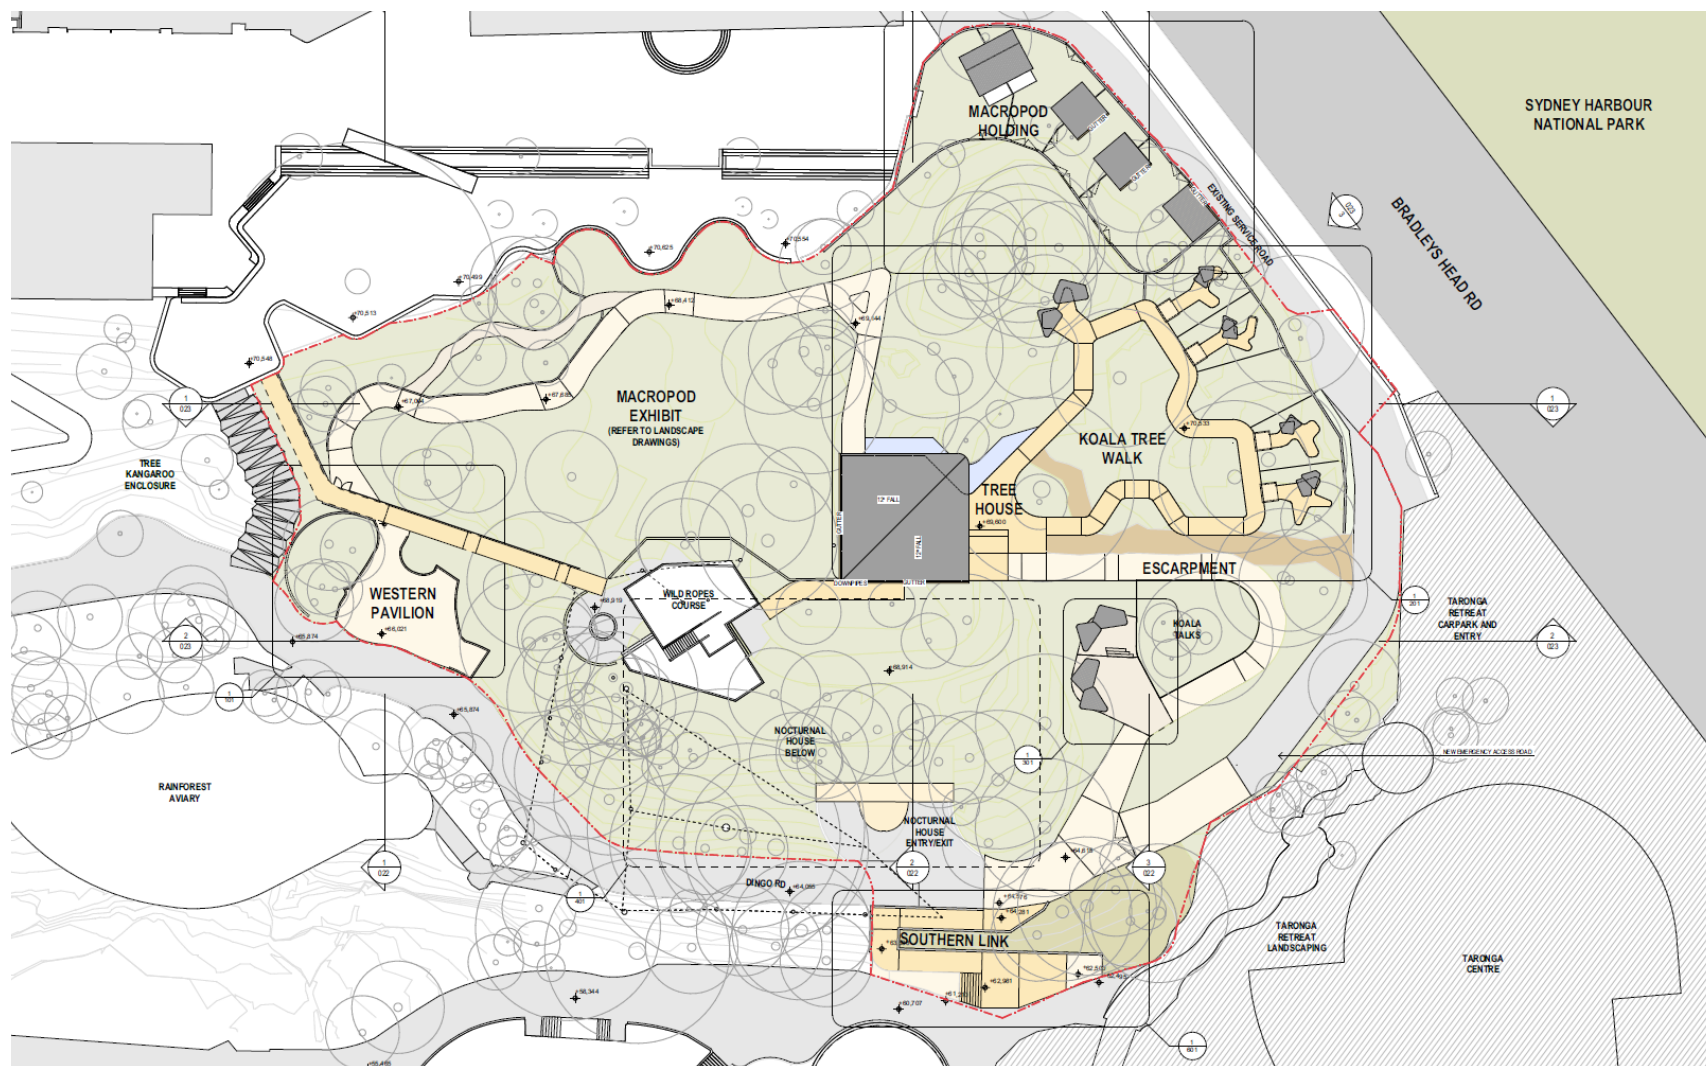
Site Plan Extract (Source: Client). North (approx.) to top of page.
